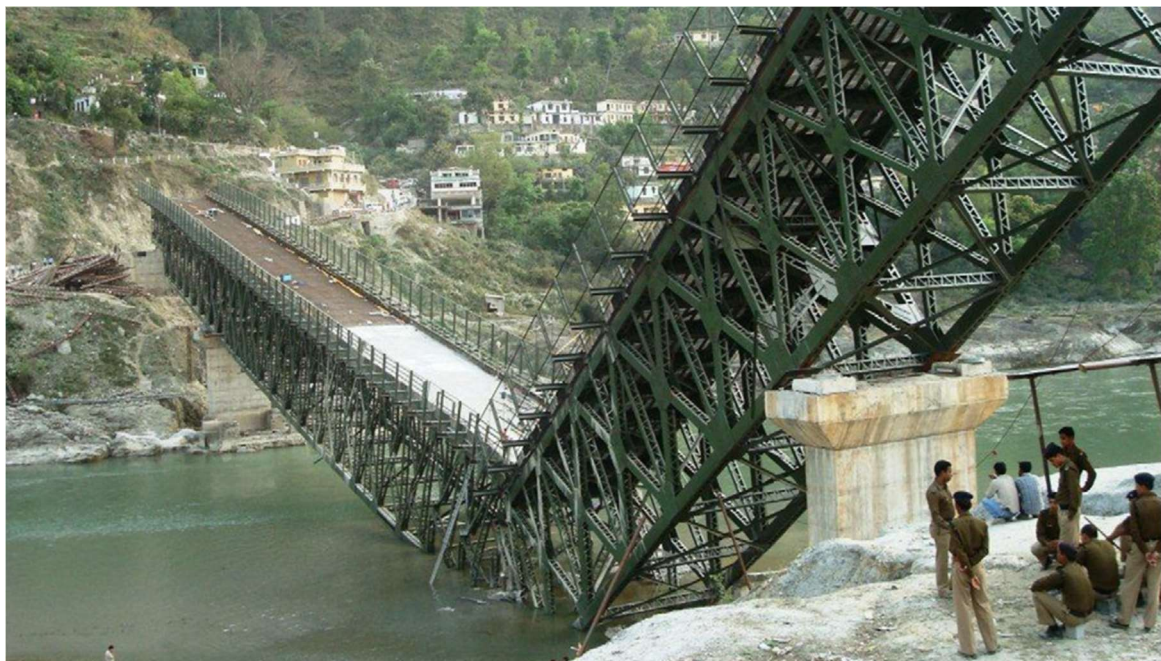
Failed Chauras bridge during deck casting (Birajdar et al. 2014)
